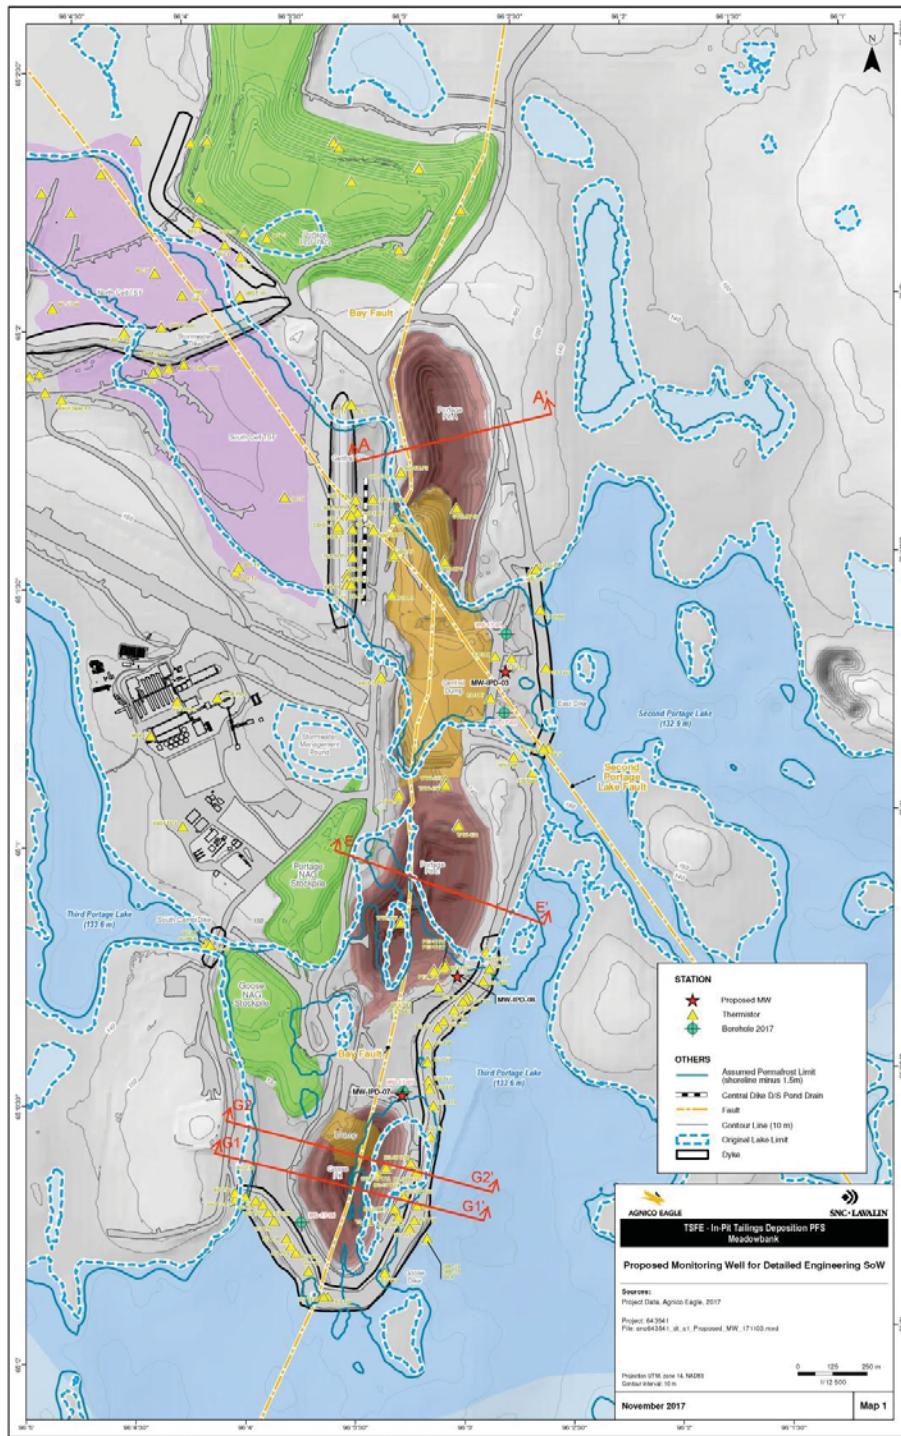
Site Plan showing thermistor location and sections analyzed
